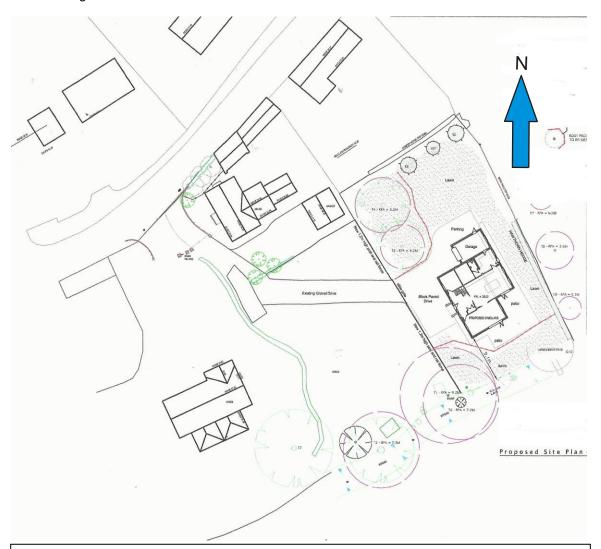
Block plan showing the existing layout of the development site at an original scale of 1:250, (extract from Architects plan)
